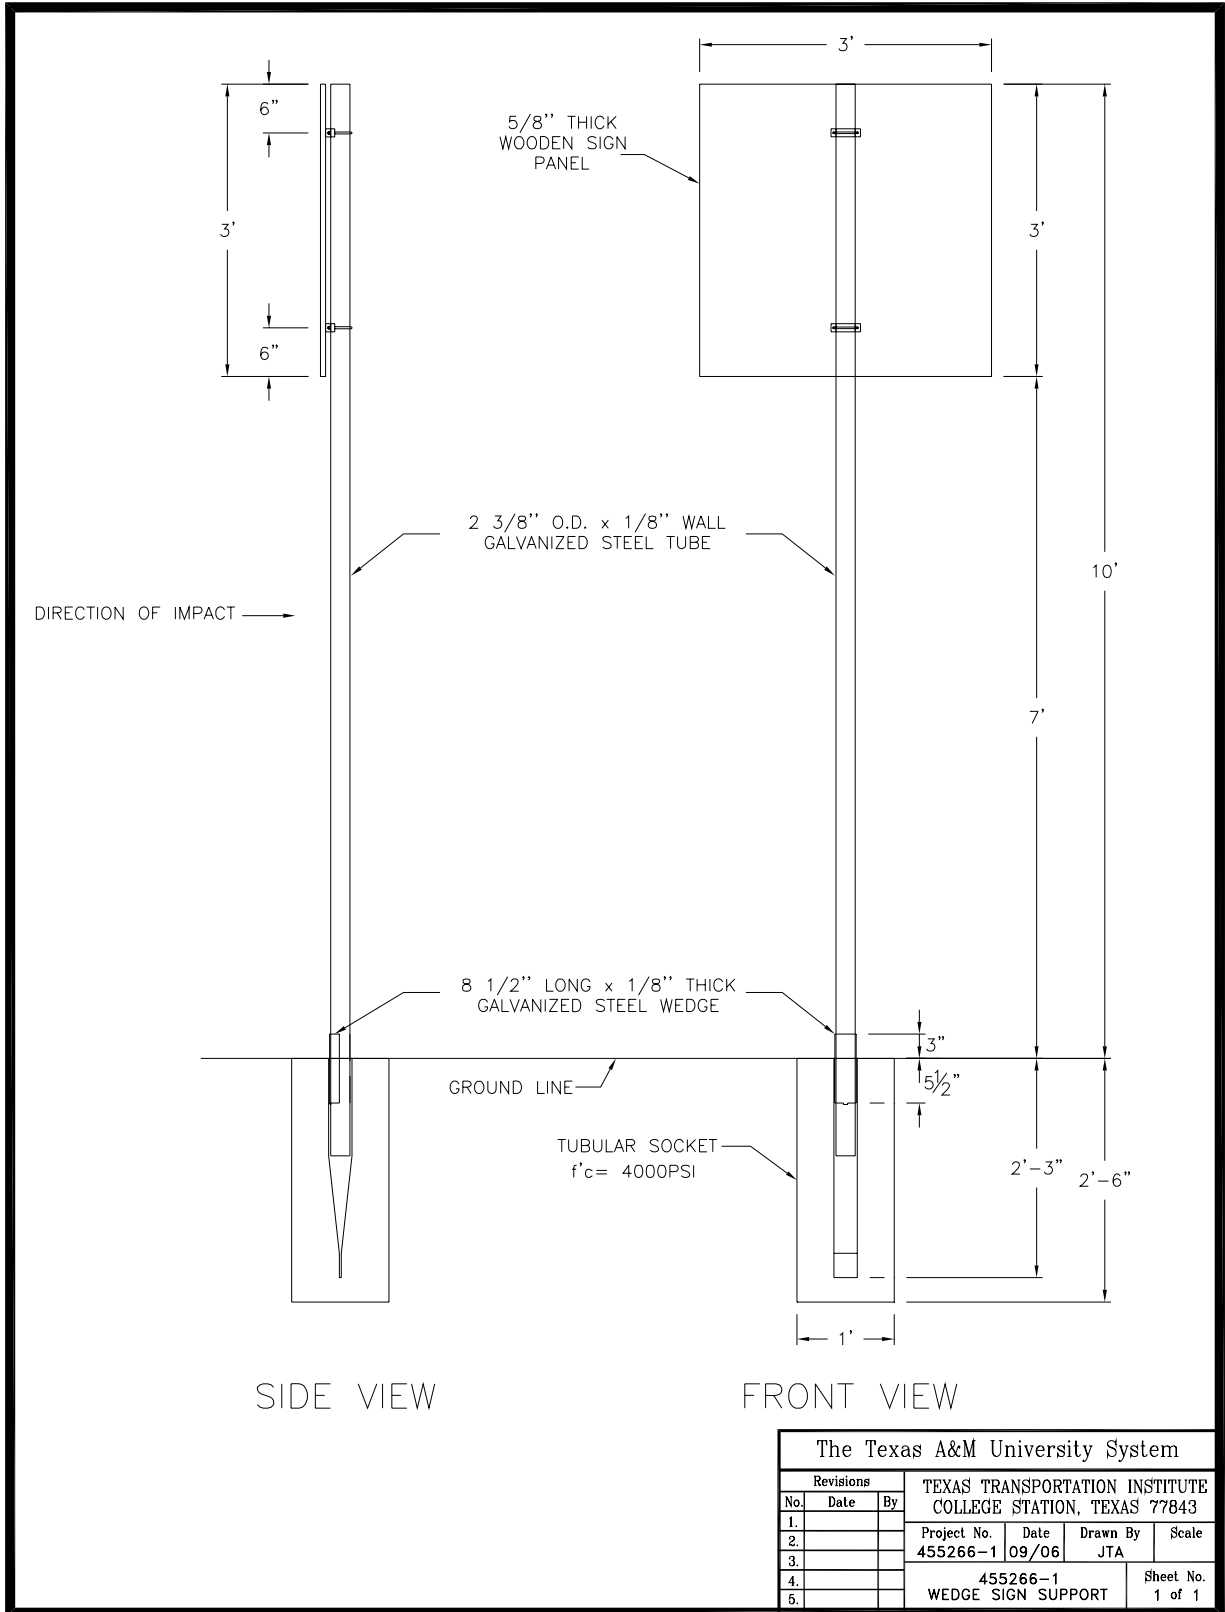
Details of the Wedge Anchor Sign Support System.
